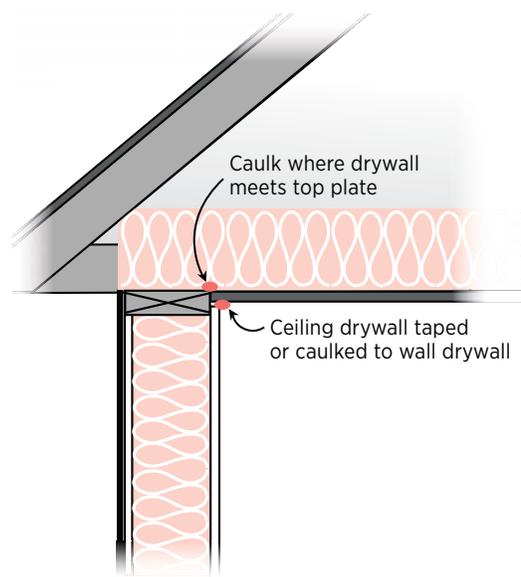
Seal the wall drywall to the top plate and ceiling drywall.
